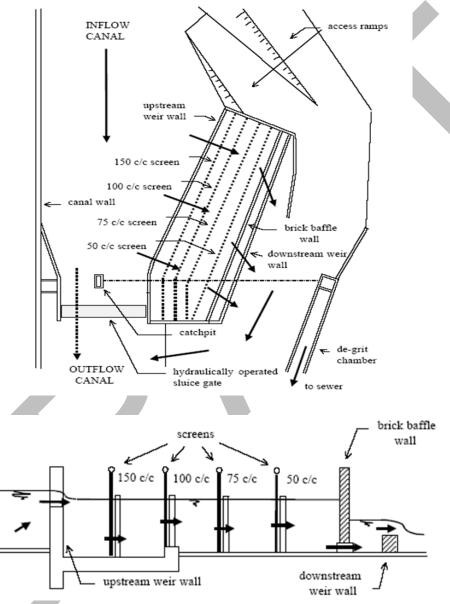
Example Plan View and Section of Screens at Canal Control Works
